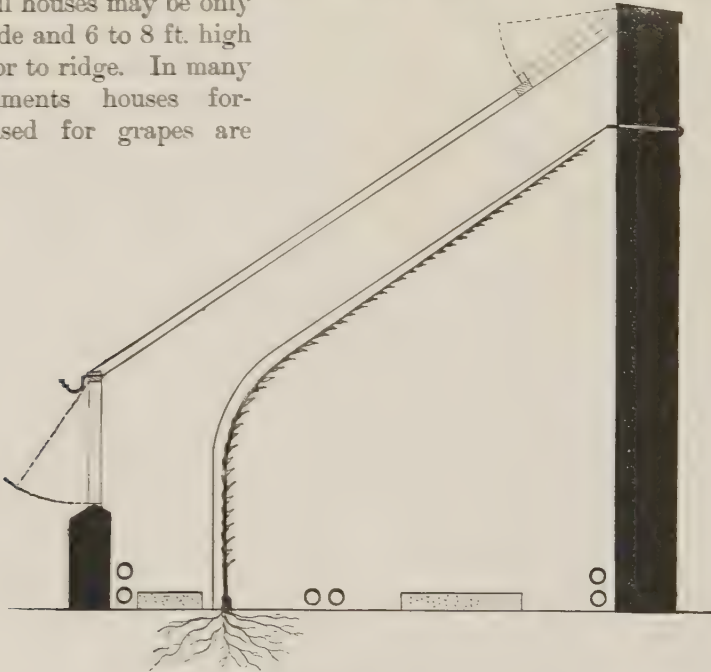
Early Peach House. Scale $\frac{1}{4}$ in. to 1 foot
